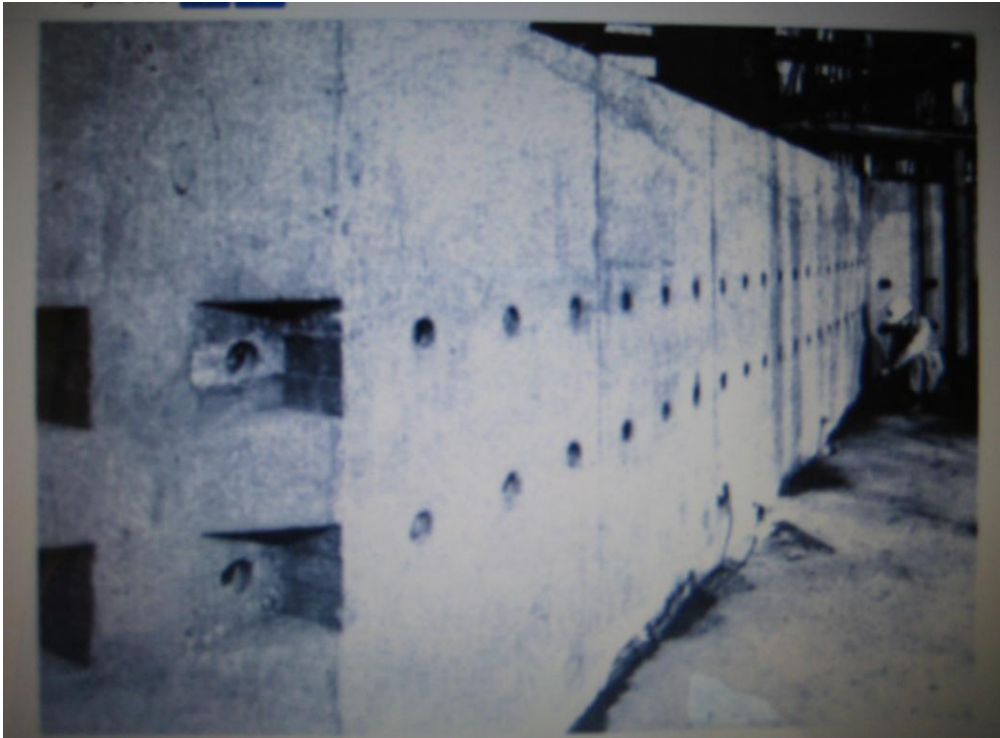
Enlarged foundations, central tower, York Minster, England
